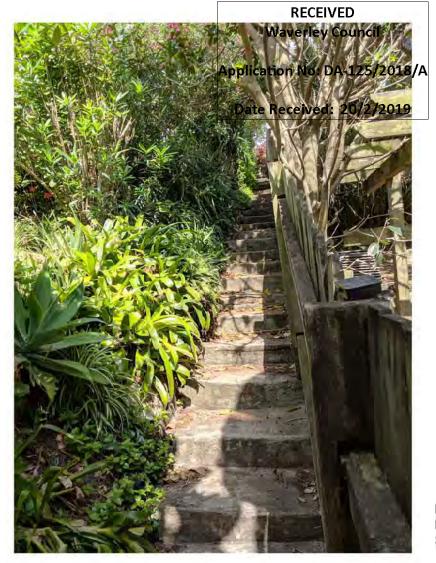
PHOTO OF THE PRIVATE ACCESS LANE BETWEEN THE SUBJECT SITE AND 20 SANDRIDGE ST (1.2m WIDE).
